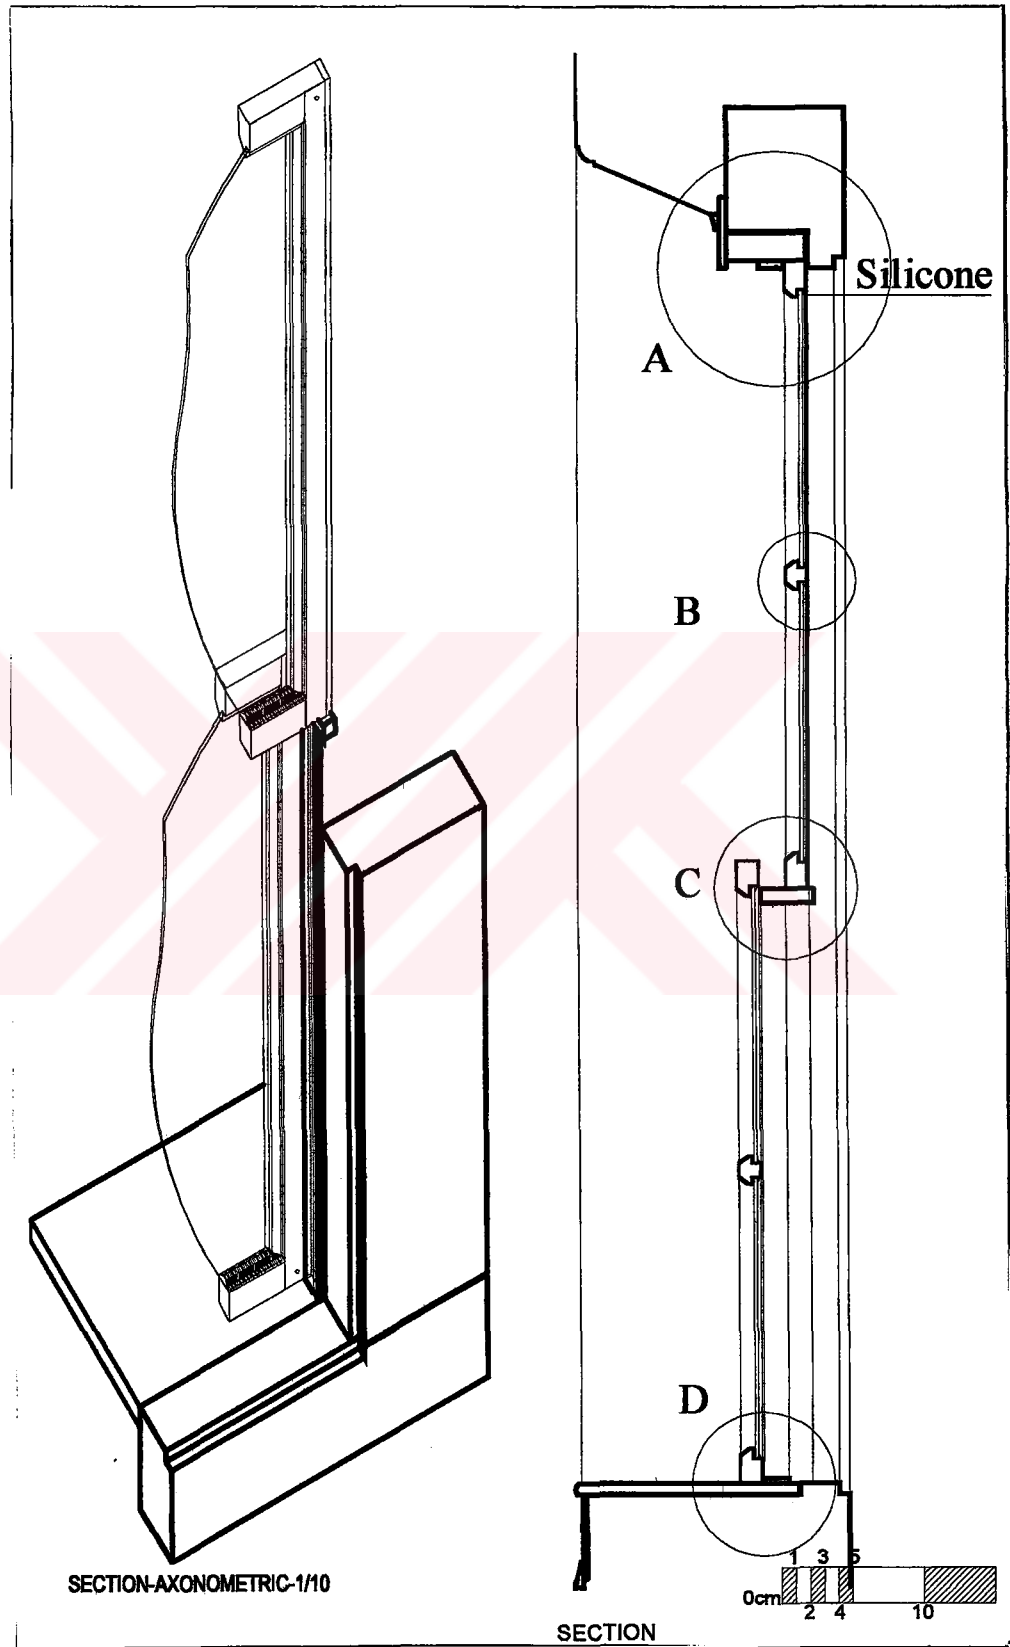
W03B Recommendations – Section and 3D Drawing
